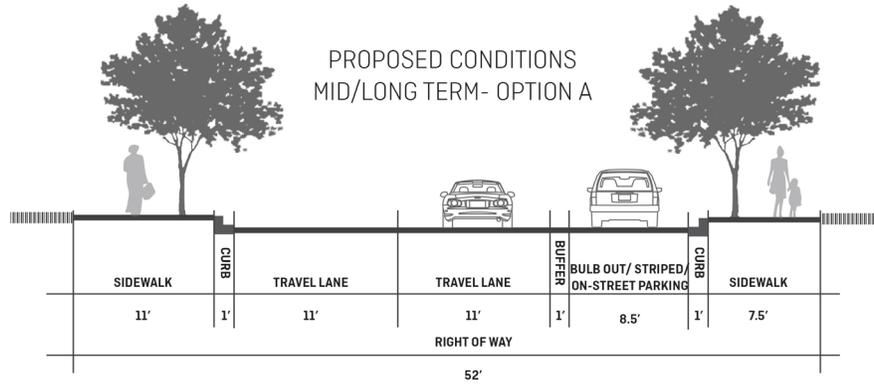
King Street at Brevard Avenue (East Bound)
